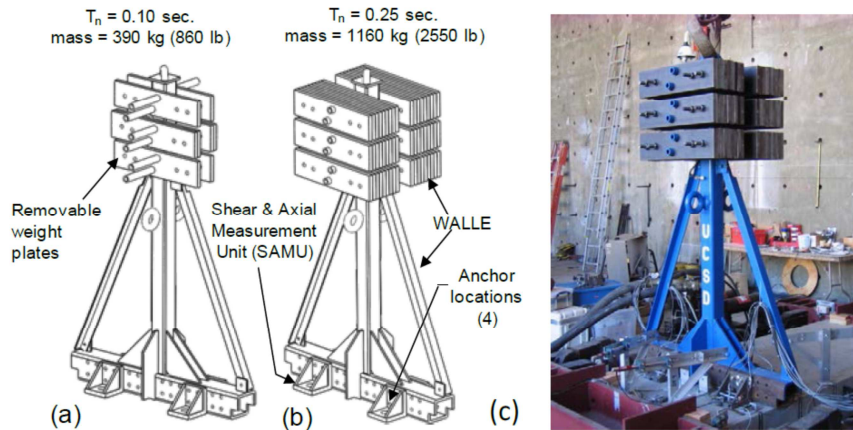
Shake-table testing of a steel system anchored to concrete slab (Watkins 2011)
